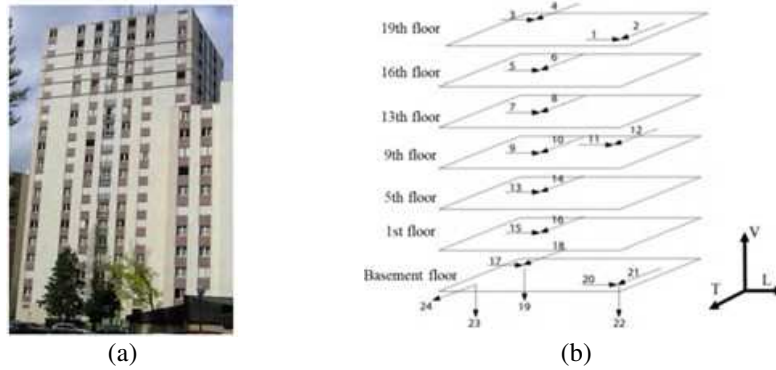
The Ophite tower: (a) street view, (b) instrumentation layout
